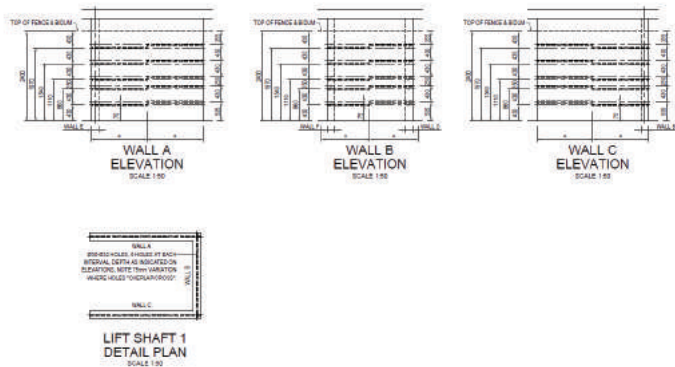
Drilling Details for Lift Shaft of Ground Floor and First Floor
